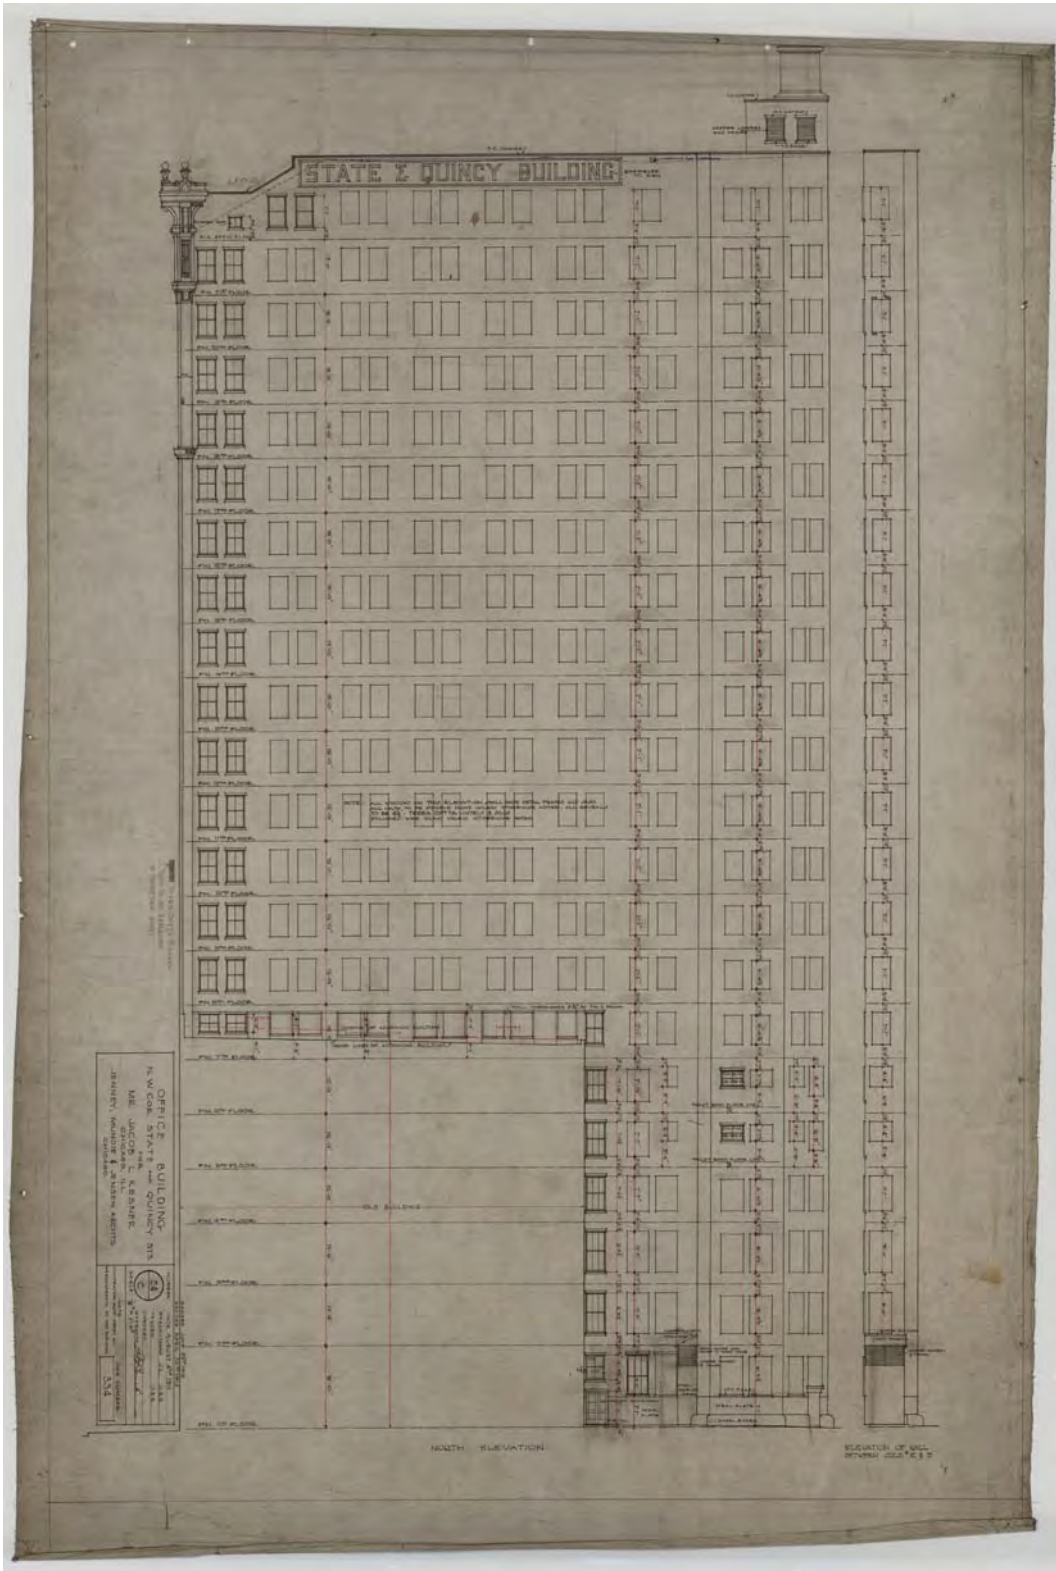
Original drawing of north façade, Jenney, Mundie & Jensen, 1911.
